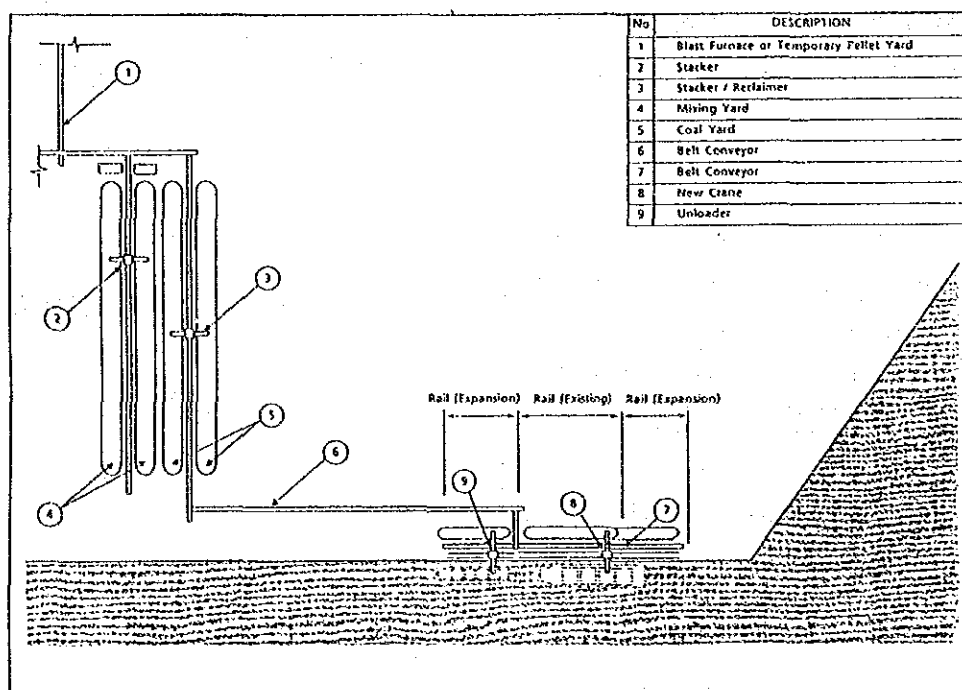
General Plan for Expansion, Sicartsa Berth, Lazaro Cardenas
